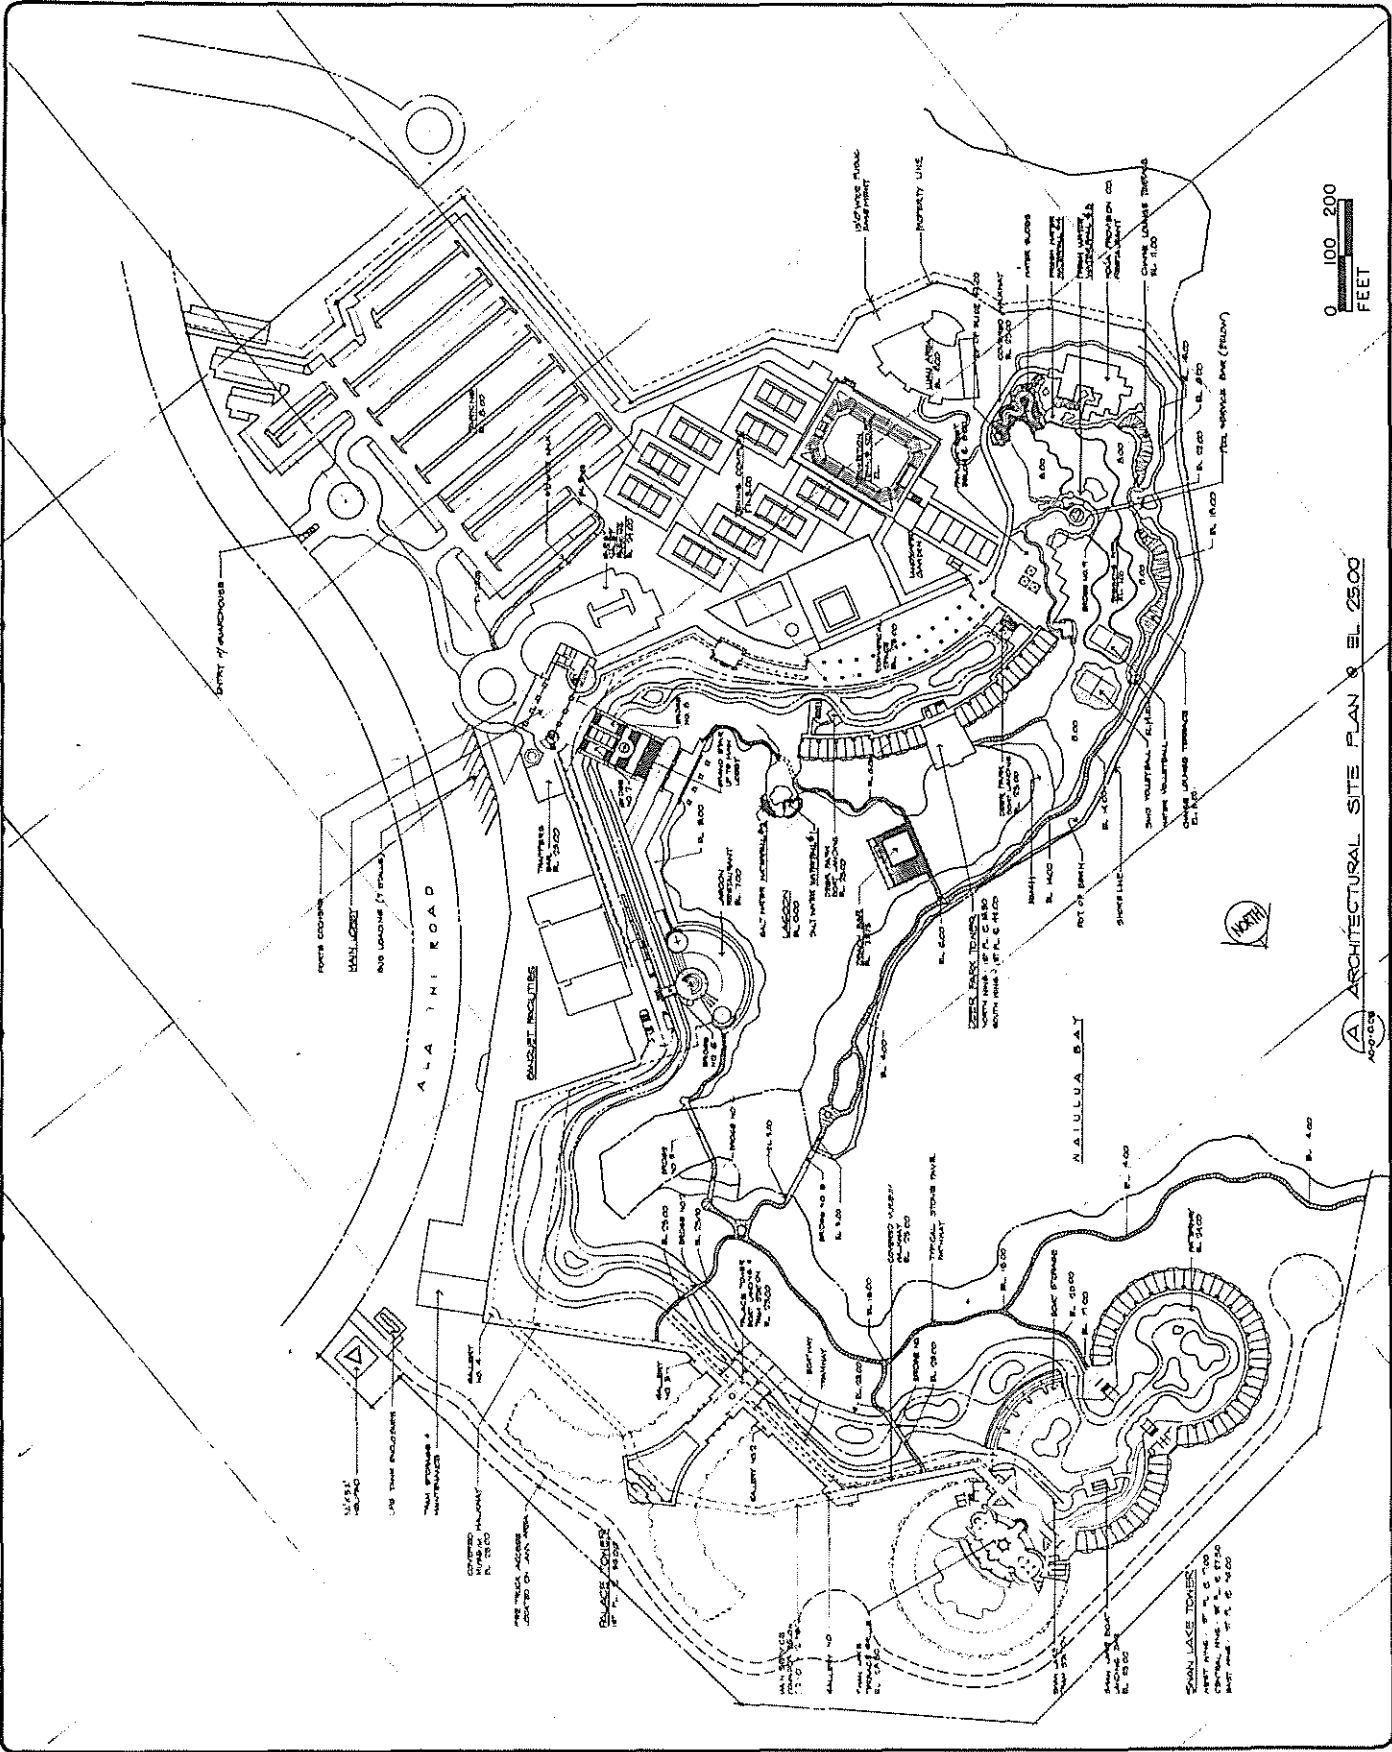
Architectural Site Plan: Hyatt Regency Waikoloa Hotel
